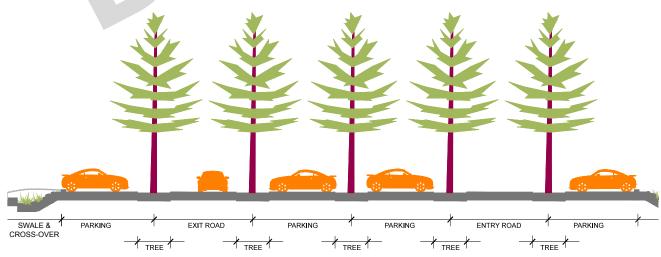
| Indicative cross section through Pier Park space showing car parking arrangement
